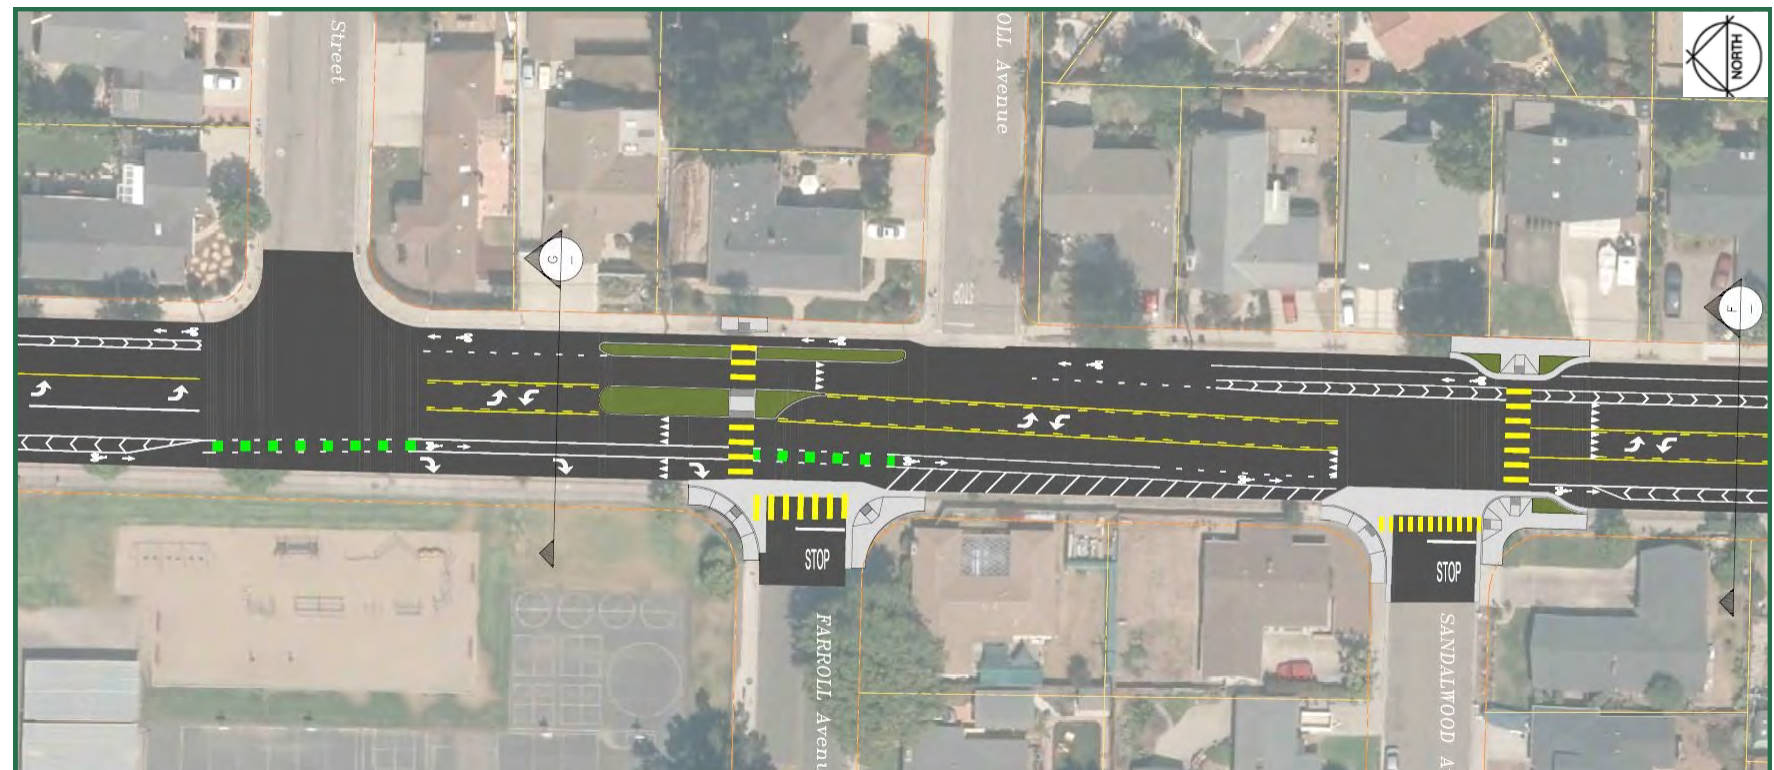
B - Recommended Context Zone 3: Section 2 Plan
